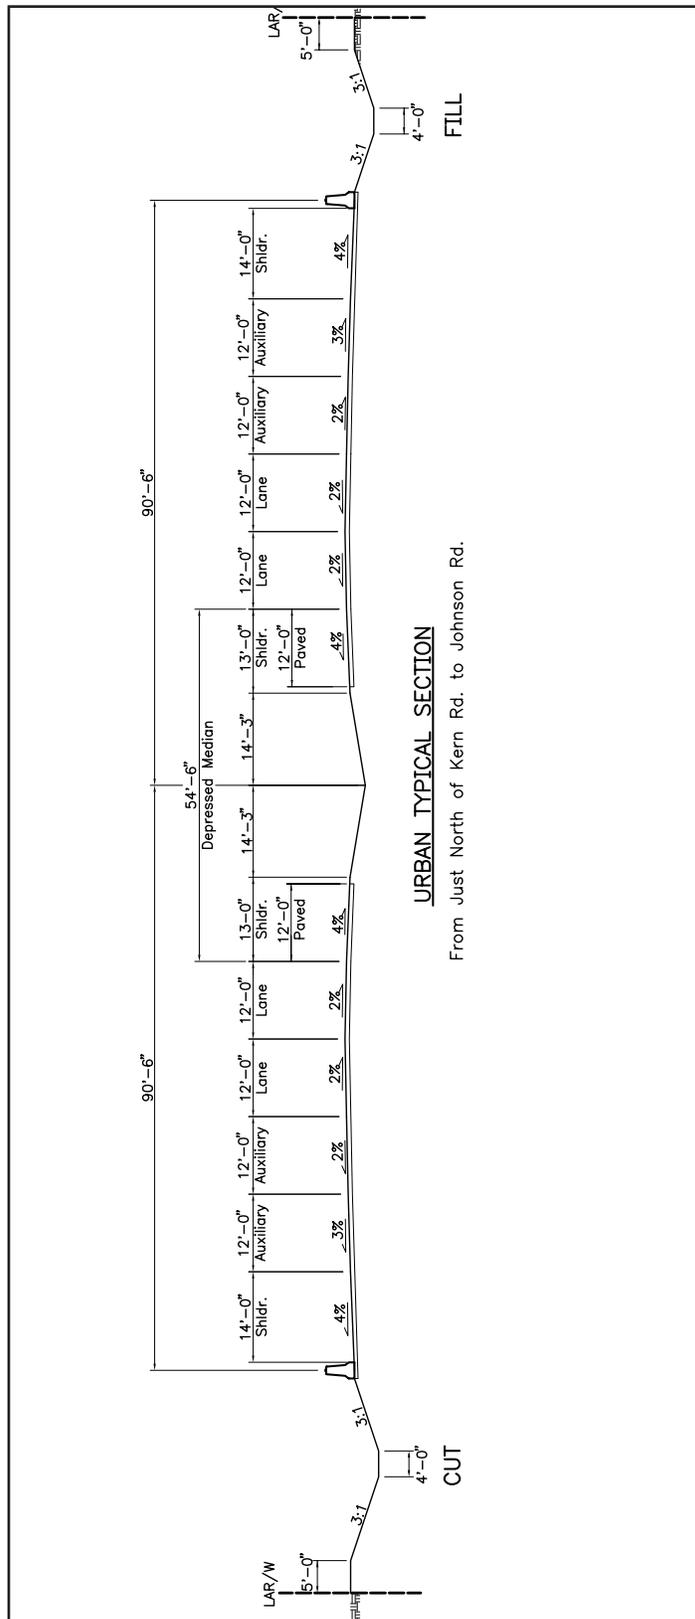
Urban Typical Section (From Just North of the Kern Road Interchange to Johnson Road)
